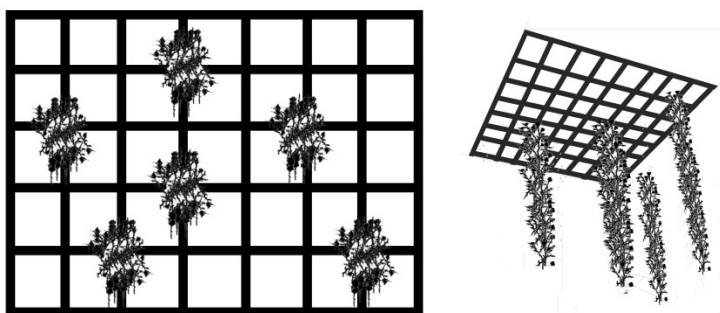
A: Application system plan of hanging vertical garden, B: Perspective appearance of hanging system vertical garden
